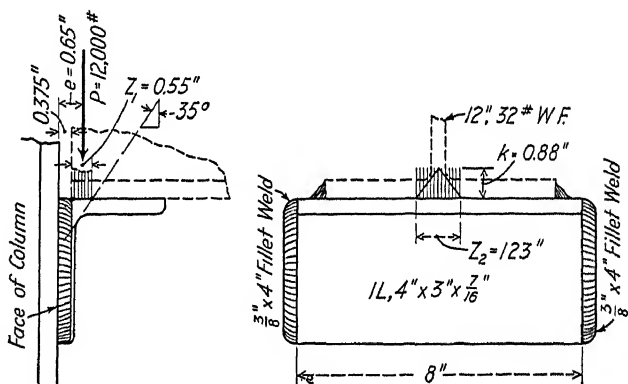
Welded Column Bracket without Stiffeners.
